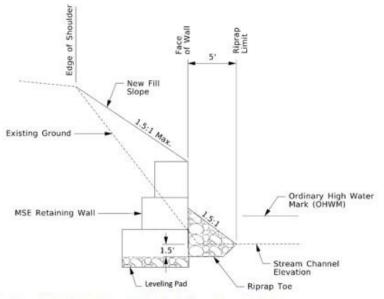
Mechanically Stabilized Earth Embankment - Detail 1.
